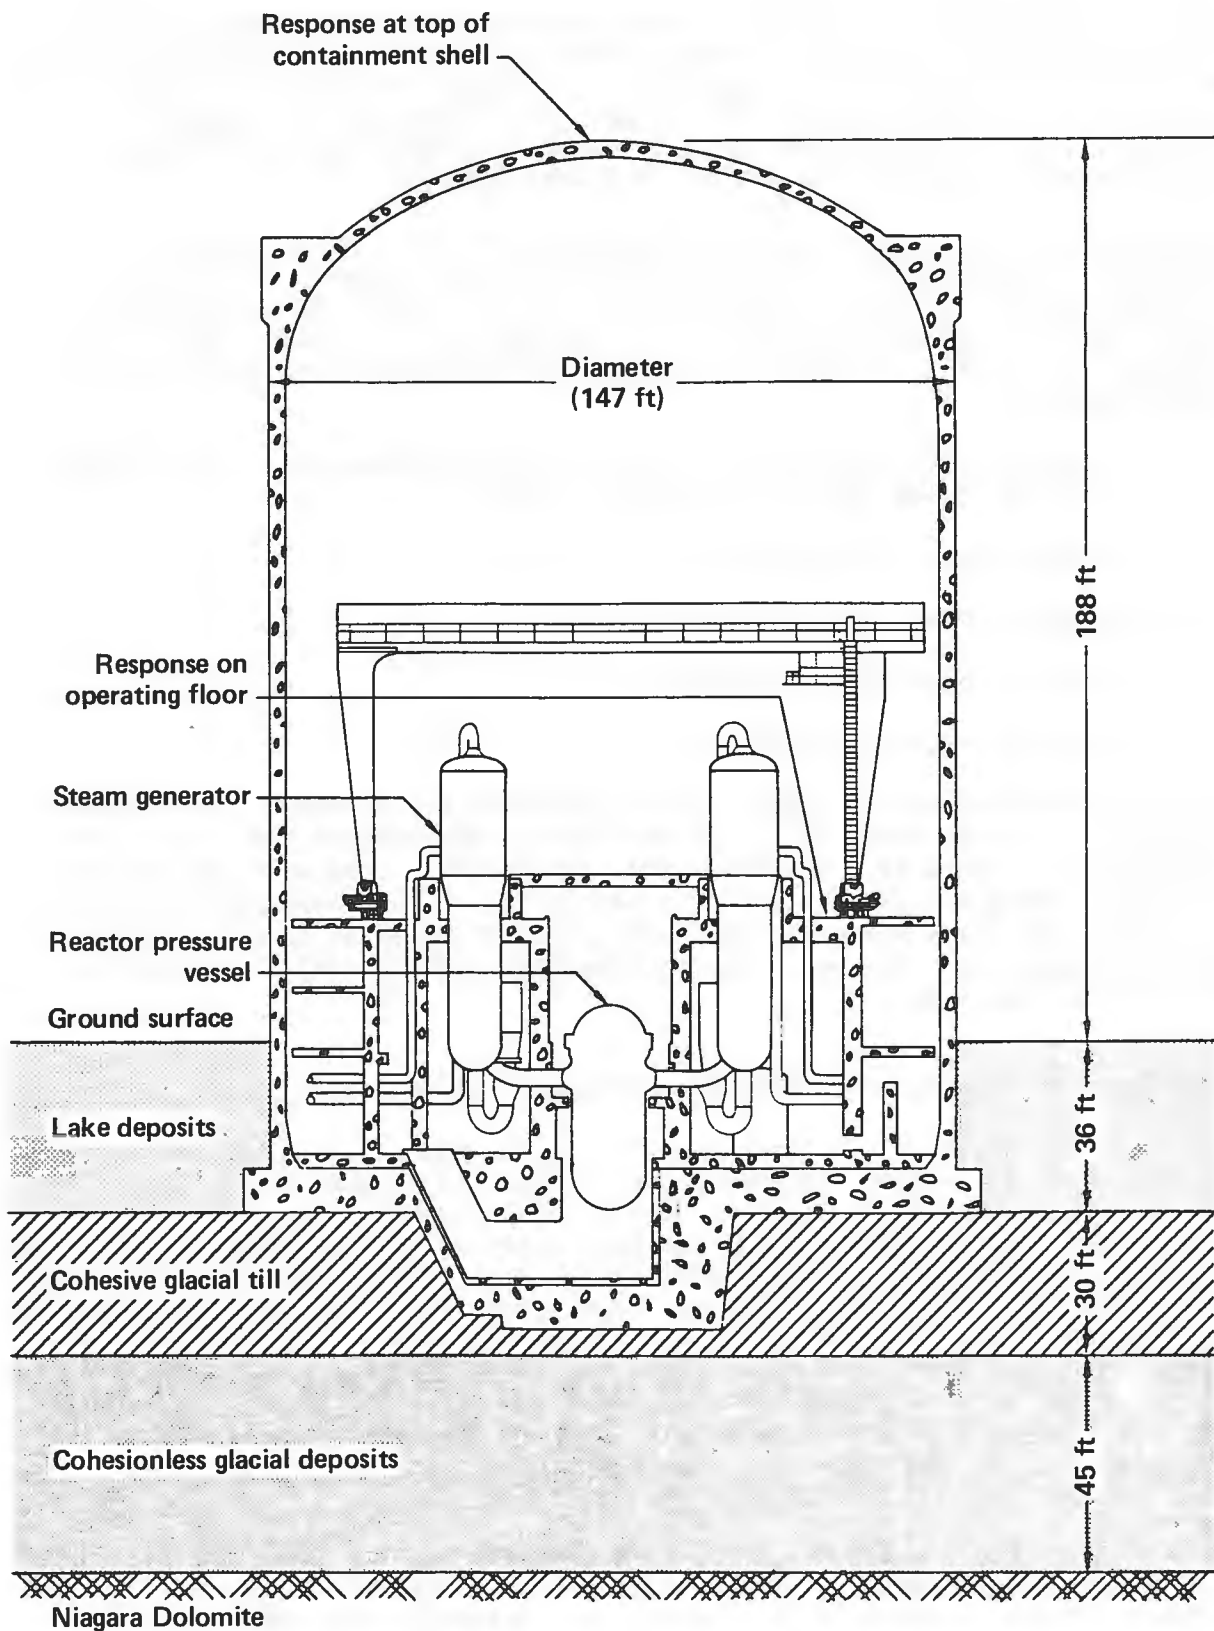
Simplified elevation view of the containment shell and internal structure at Zion.
